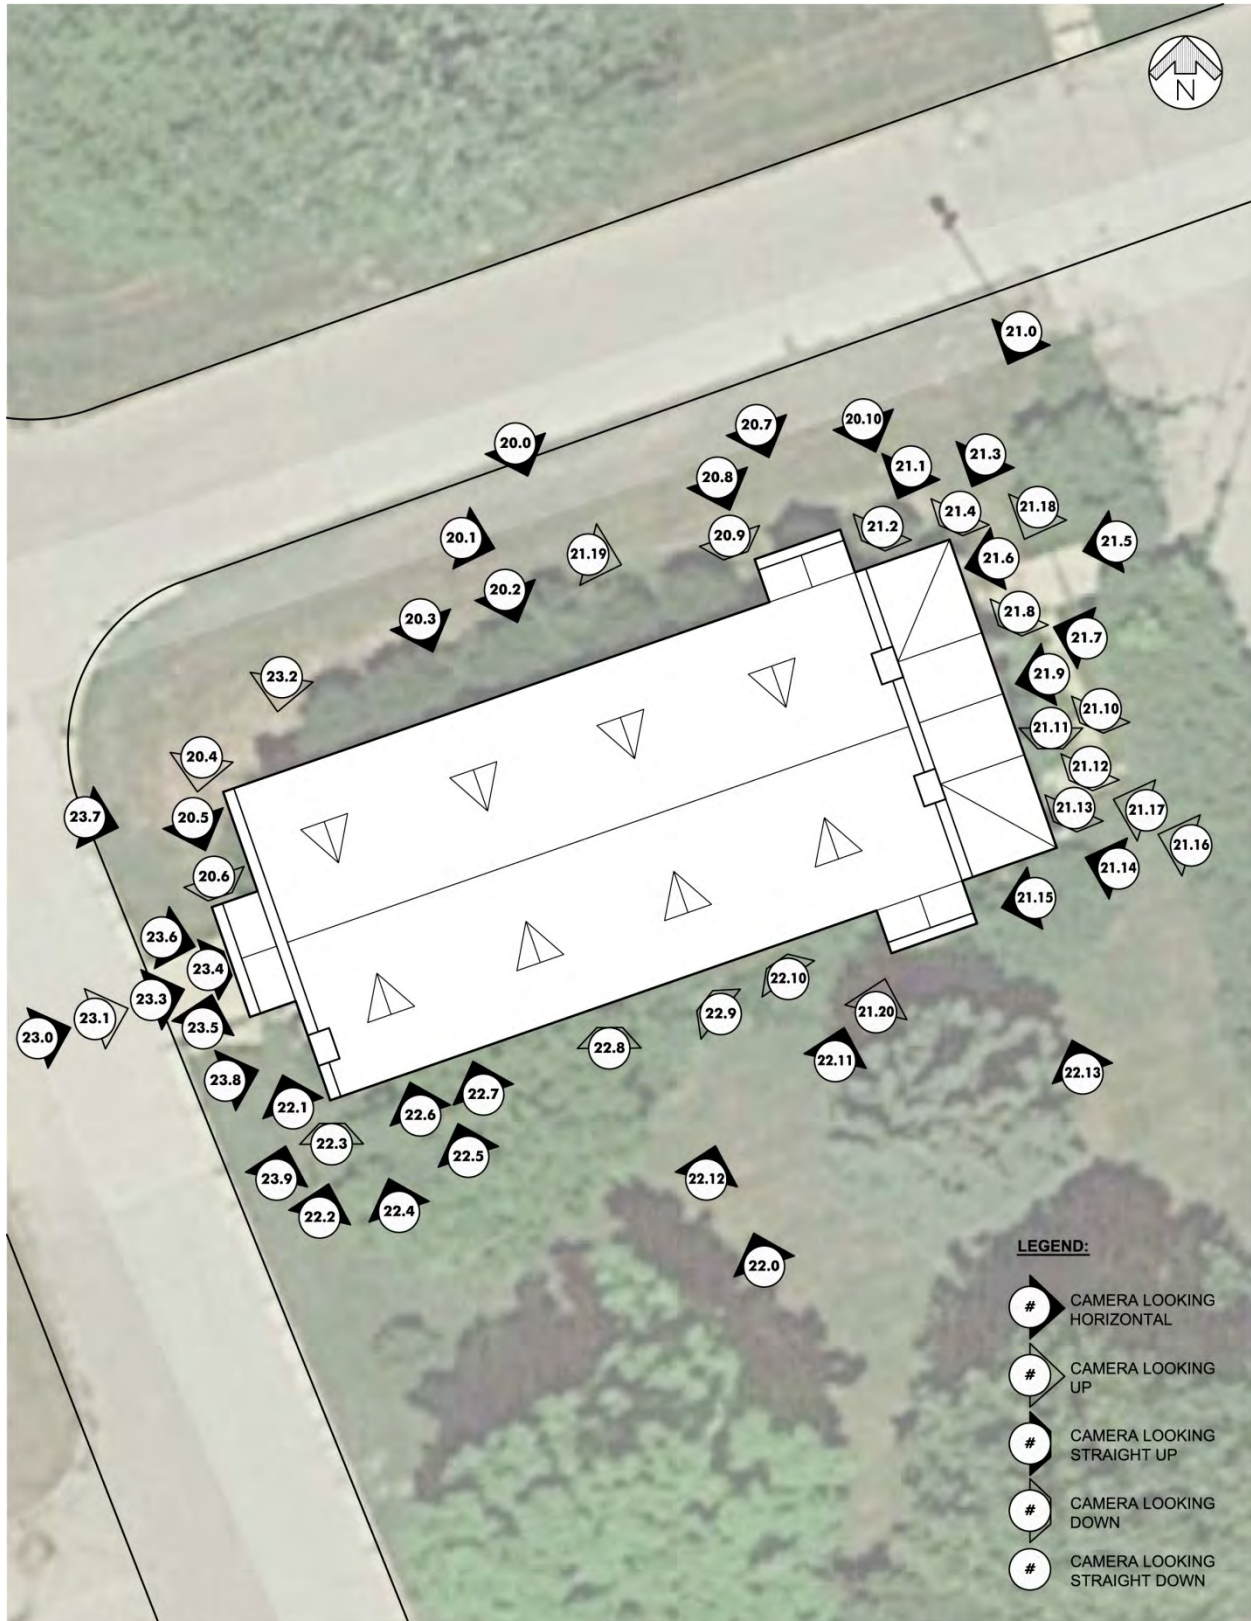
Photo No. 20.0 – 23.9 (Walls Above Grade – Brick)
